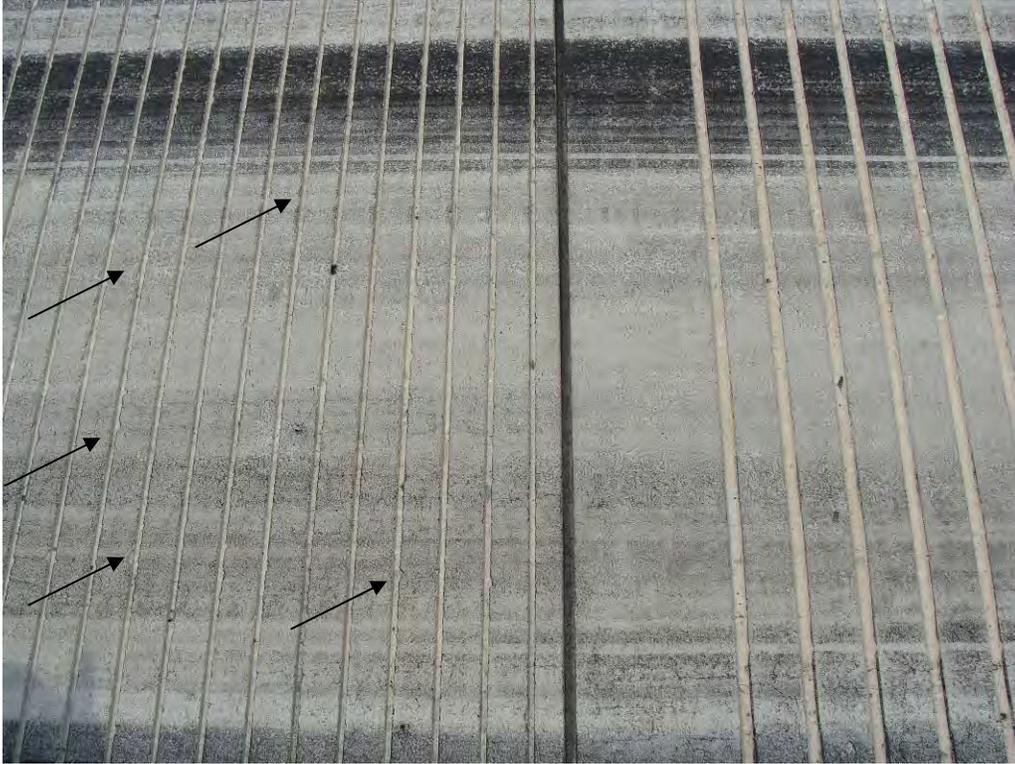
Evidence of Damage to Edges of Standard (Left) and Trapezoidal-Shaped (Right) Grooves
